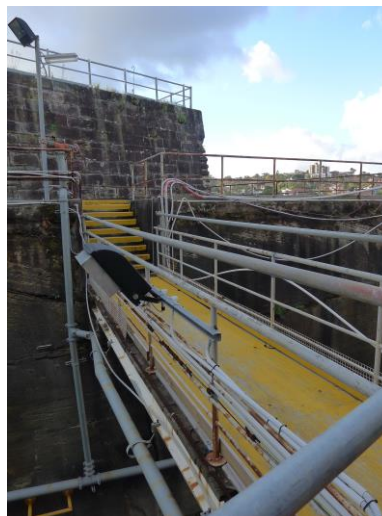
Existing bridge link between the RANTME Factory building to the top of the cliff above the Submarine School.
